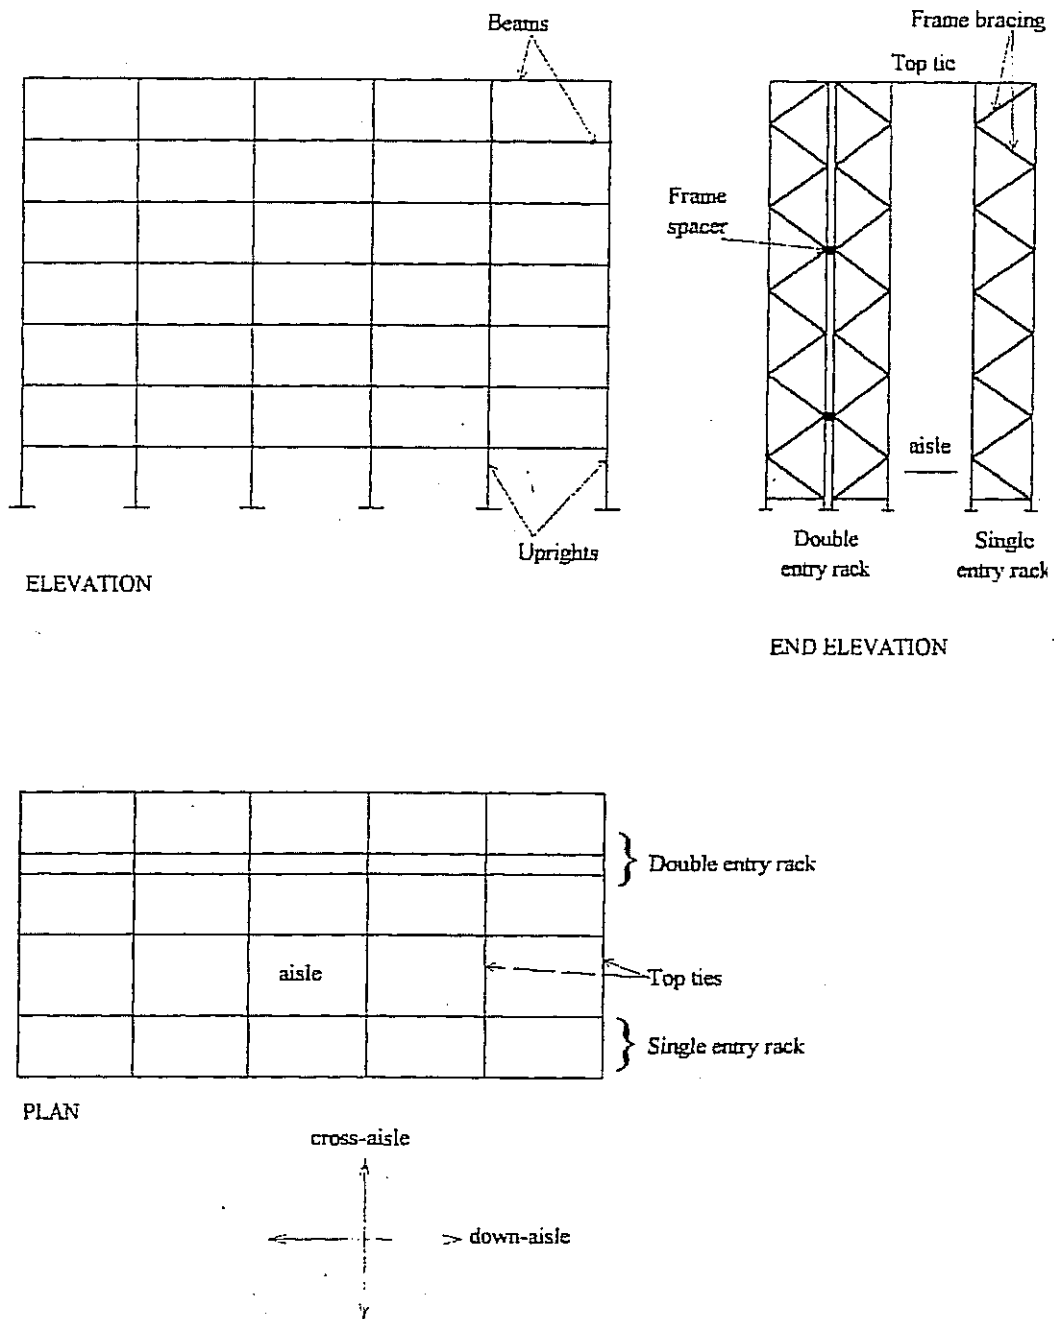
Typical configuration of an unbraced pallet rack structure
